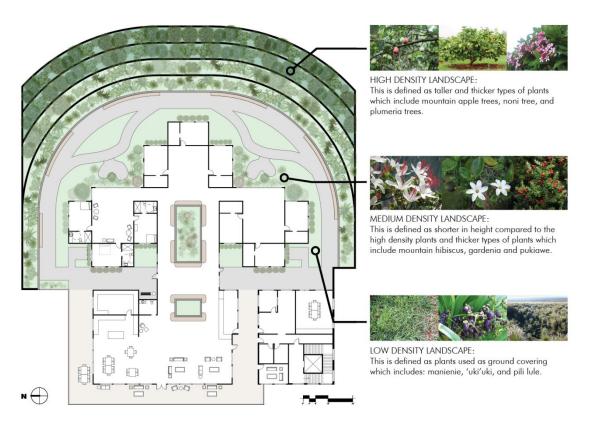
Main Level Floor Plan: Landscape Diagram
